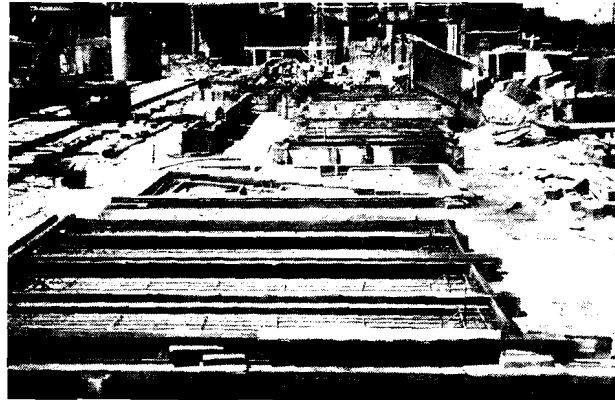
Platform with formworks for prefabrication of single elements in conventional house construction.
